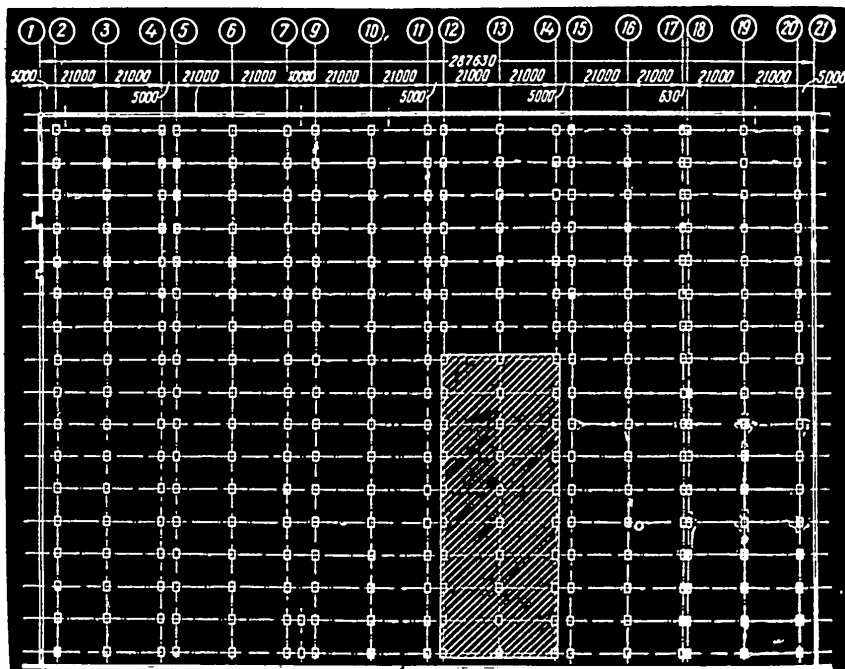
Plan of the plant. Shaded area indicates the part that collapsed.
